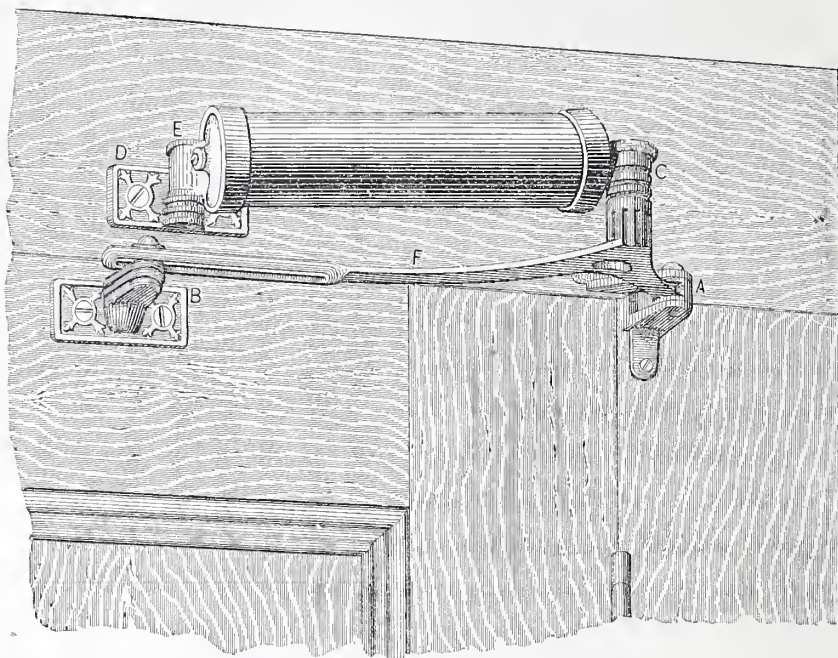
General View of the Shaw Door Check and Spring Applied to a Door.
